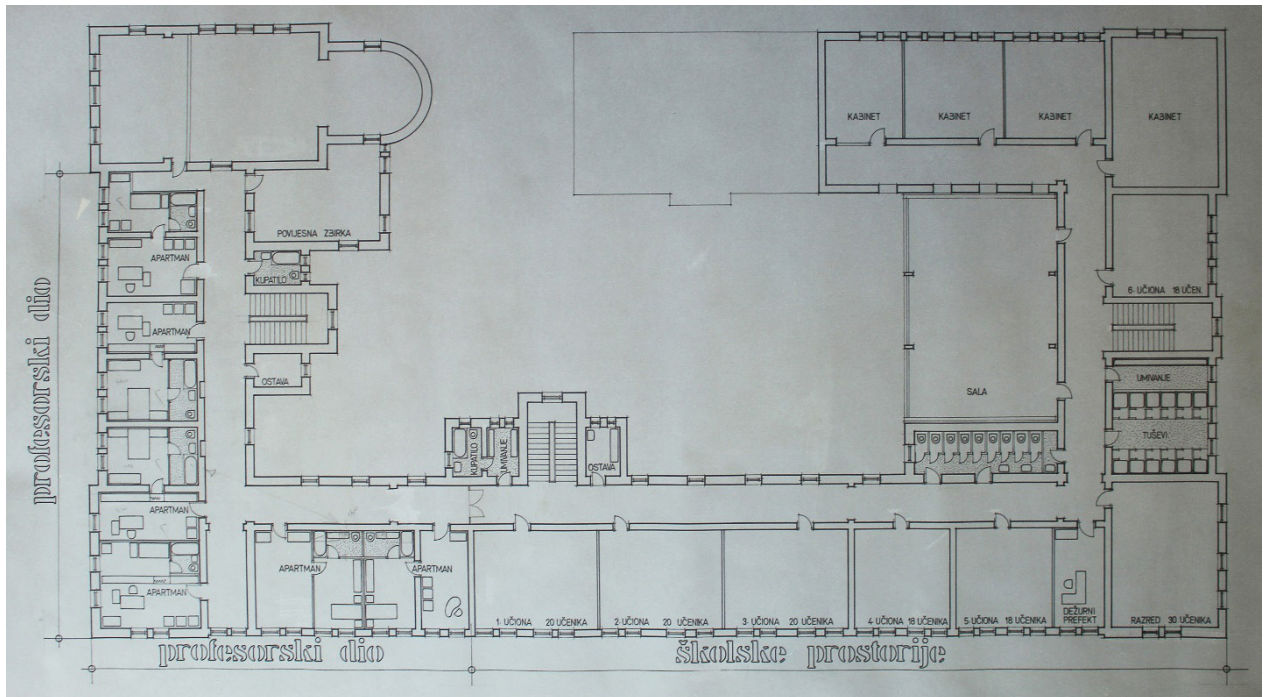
The Convent of Saint Bonaventure, Visoko: first floor plan, segment of the project for extension and reconstruction done by Vinko Grabovac in 1985 (Archive Visoko)
